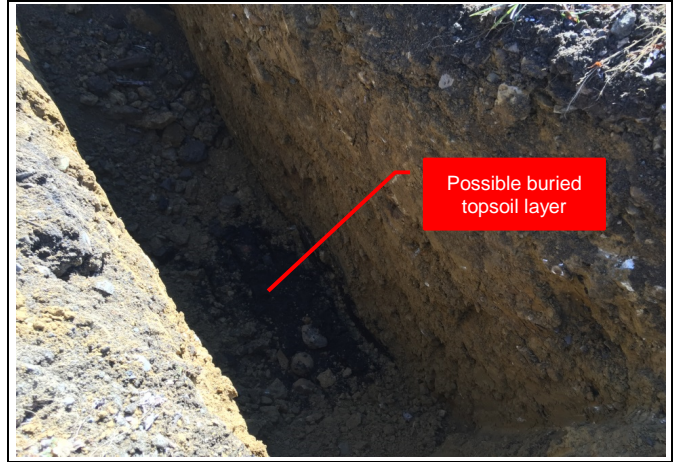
Possible buried topsoil layer encountered 4 ft. below ground surface.
